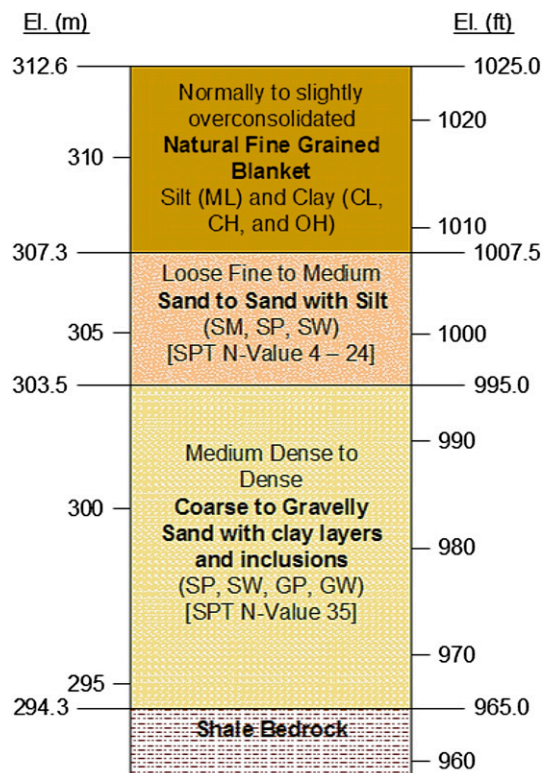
Generalized subsurface profile of alluvial foundation at downstream toe [average ground surface elevation downstream of dam, 312.6 m (1025 ft)]
